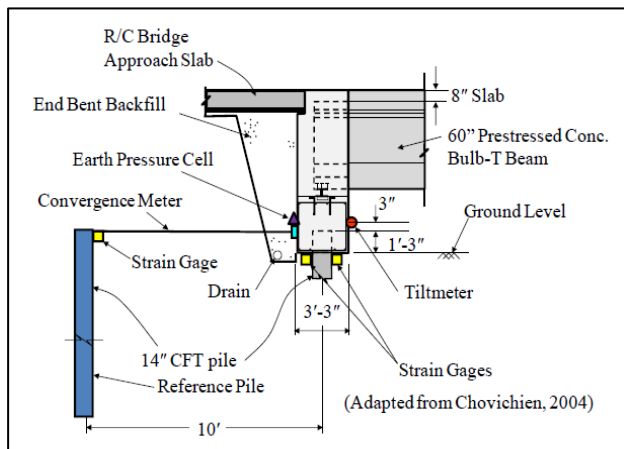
Elevation of instrumentation (Chovichien, 2004)
